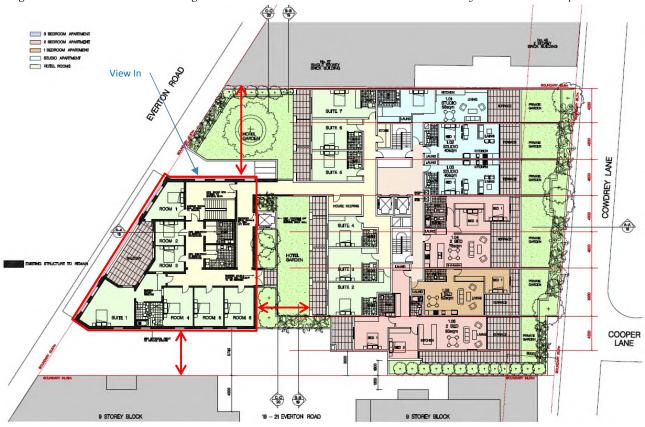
Level 1 Plan showing Major Addition set well to the rear of the existing Hotel.
